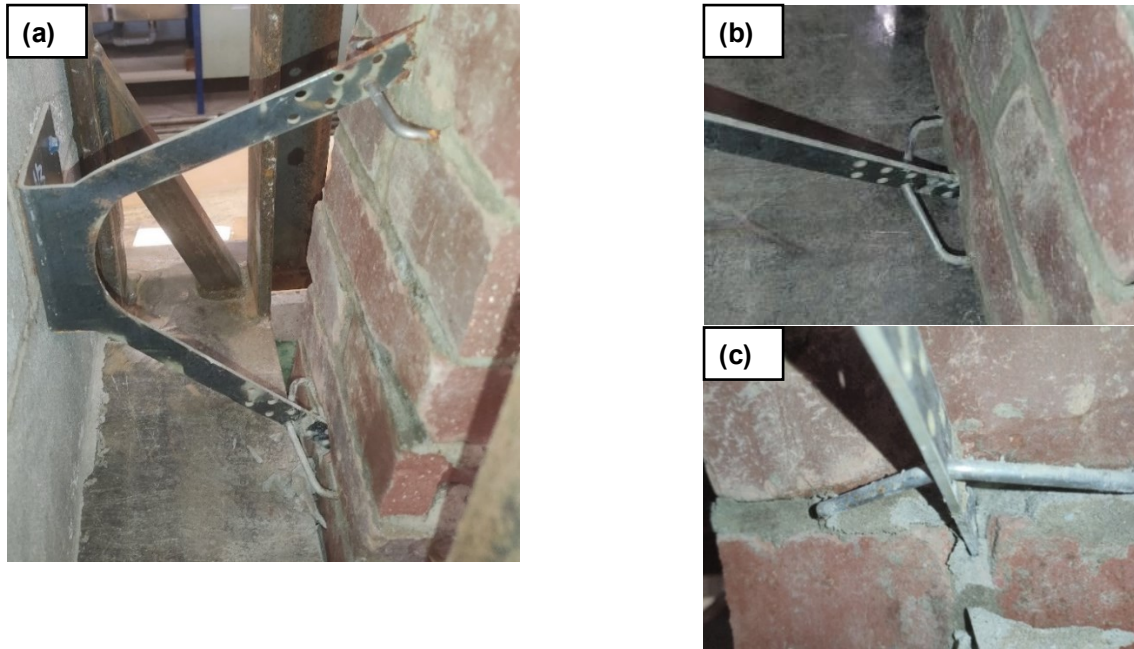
Deformation of NC connector (75 mm embedment): a) specimen before the test, b) bottom plate pull-out, and c) embedded bar.
